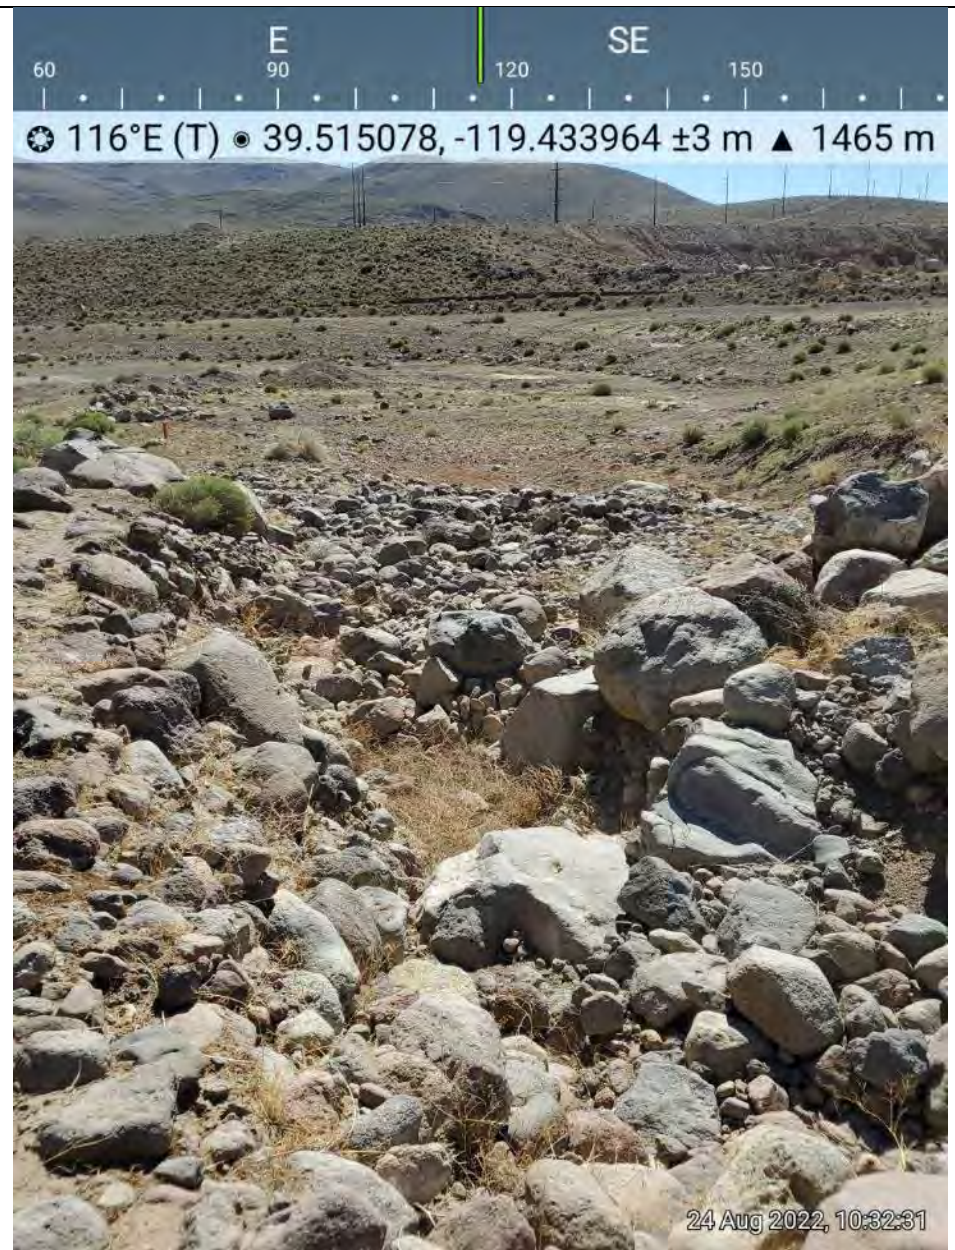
Top and downstream side of rock check dam #2 into retention basin.
